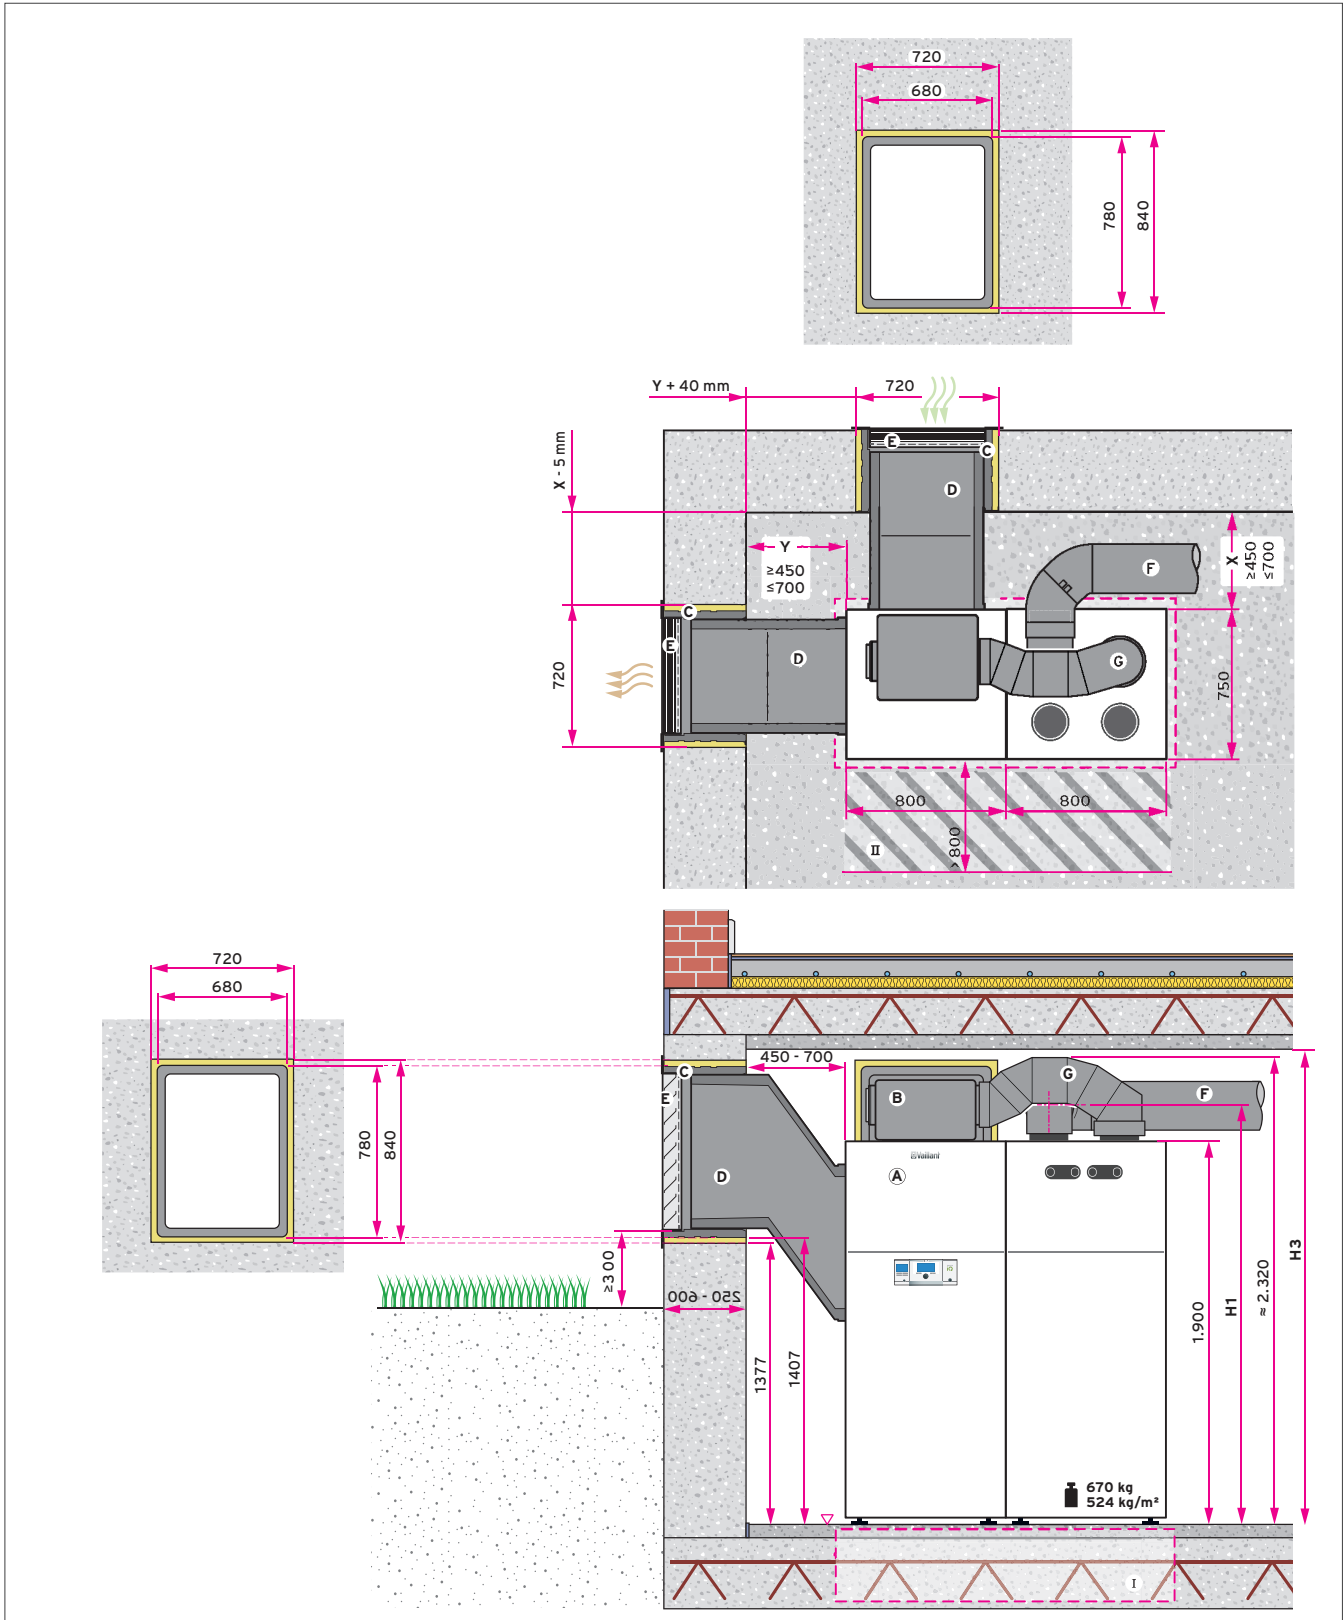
recoCOMPACT installation situation, ground floor - left-hand installation in the corner of a room, air supply via cellar adapter
